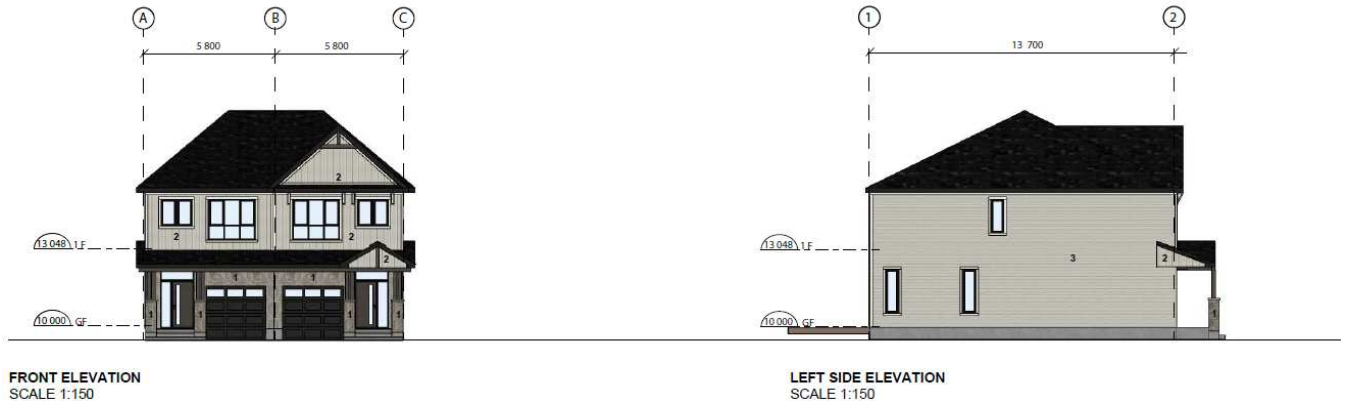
Front and left side elevation of Townhouse Model 2 - "D".
